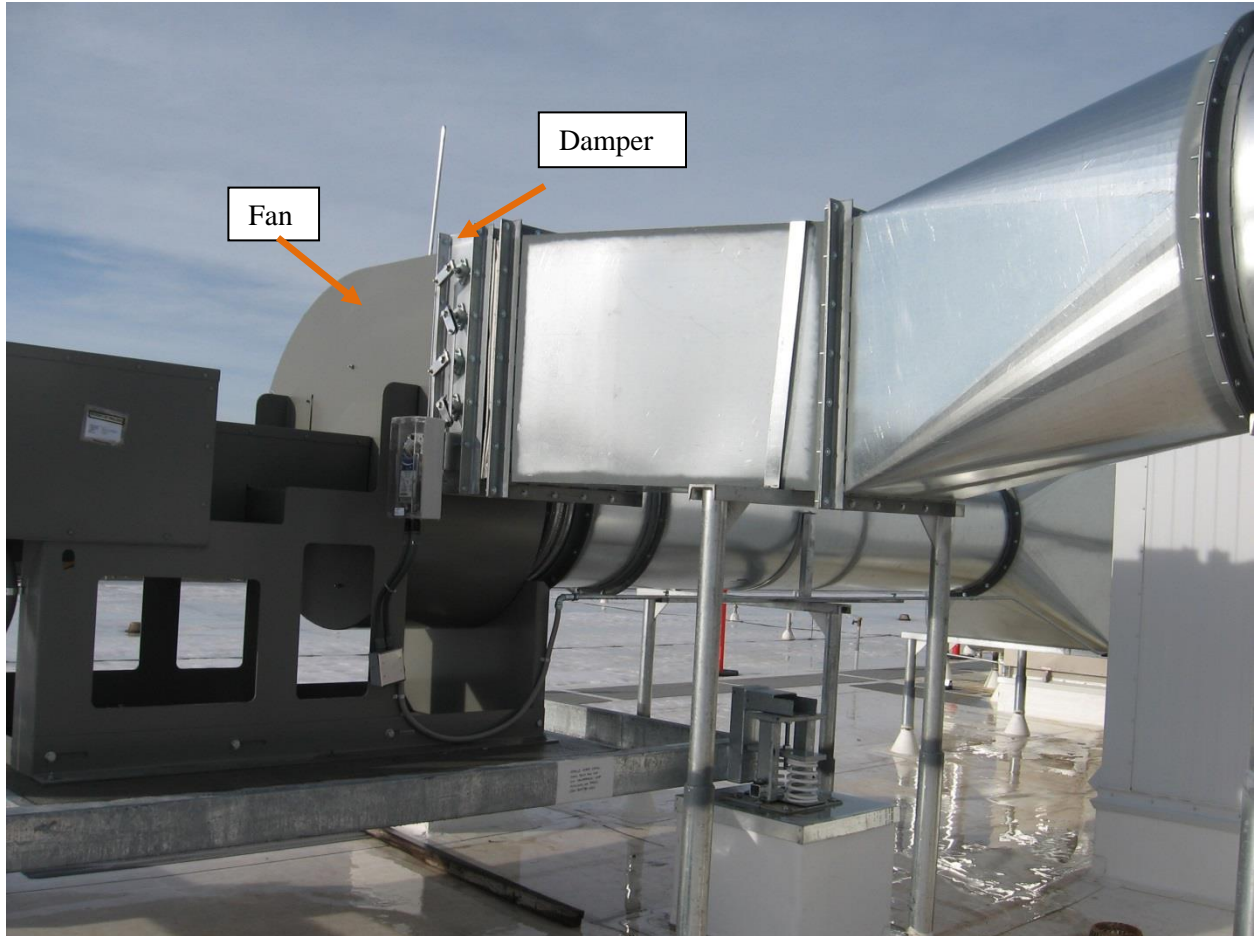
A Photo Showing the Fan and the Damper on the Roof of the 3410 Building.
